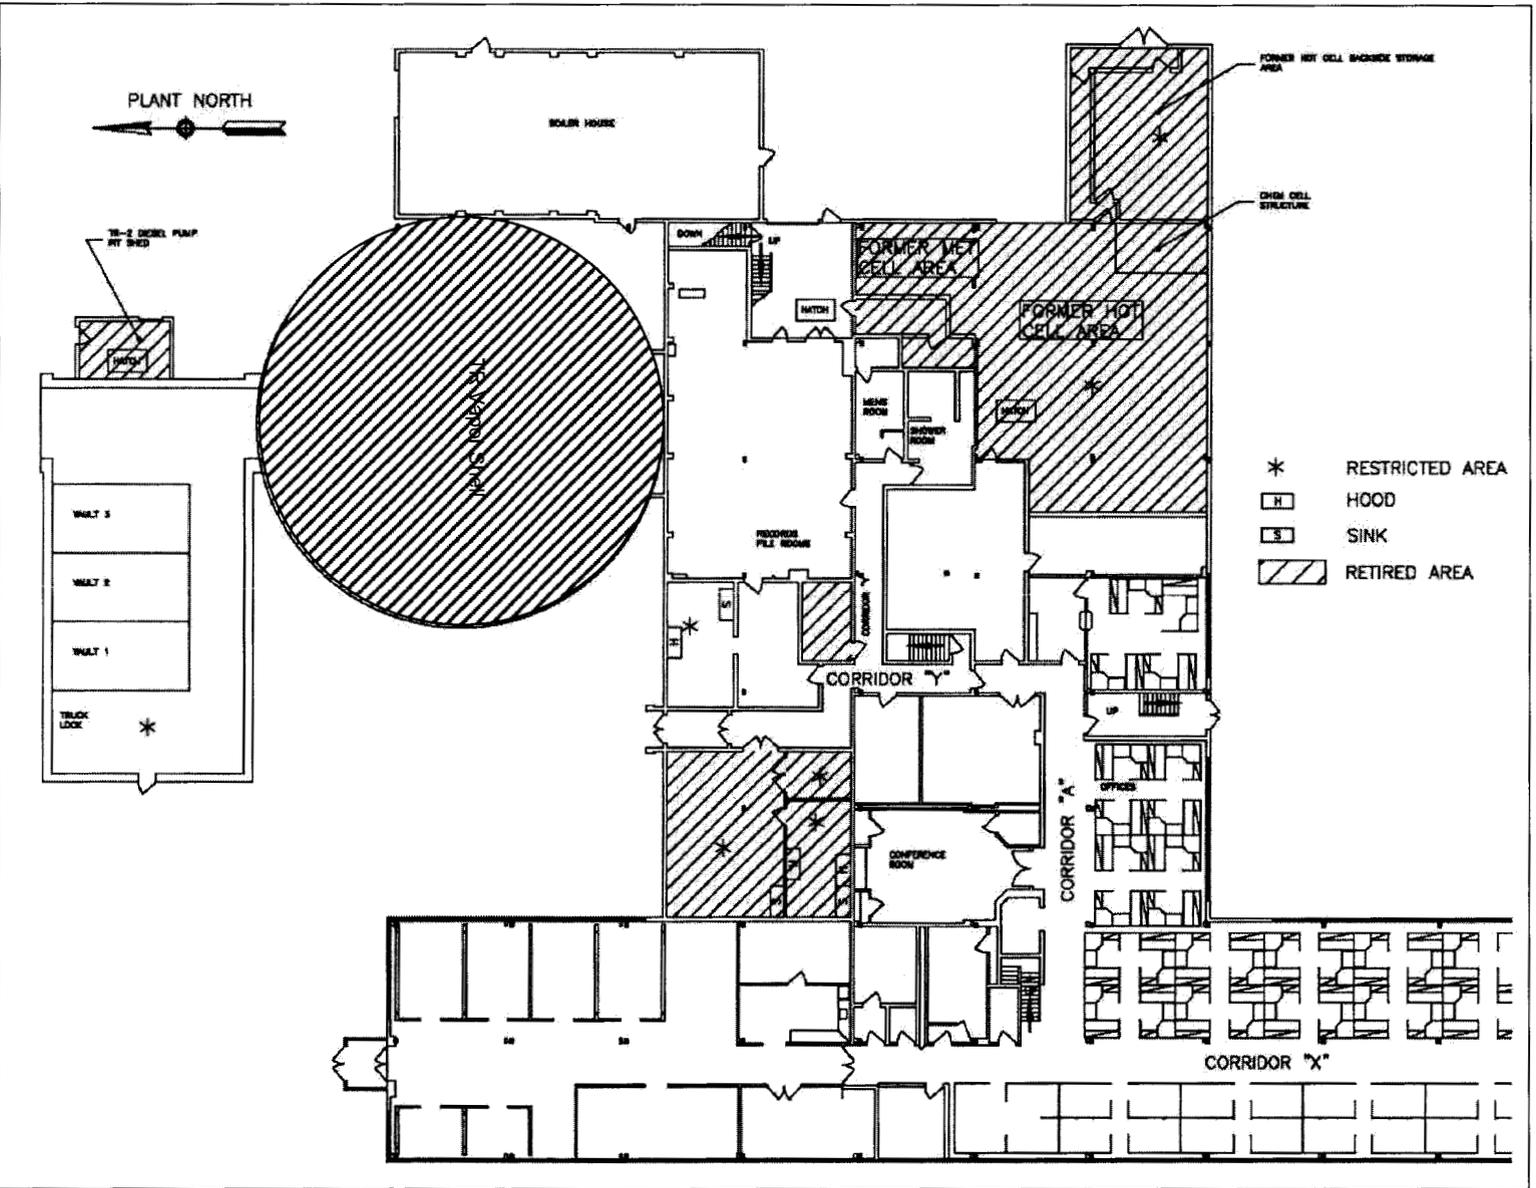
First Floor G Building North Wing, Test Reactor (TR), and Truck Lock
